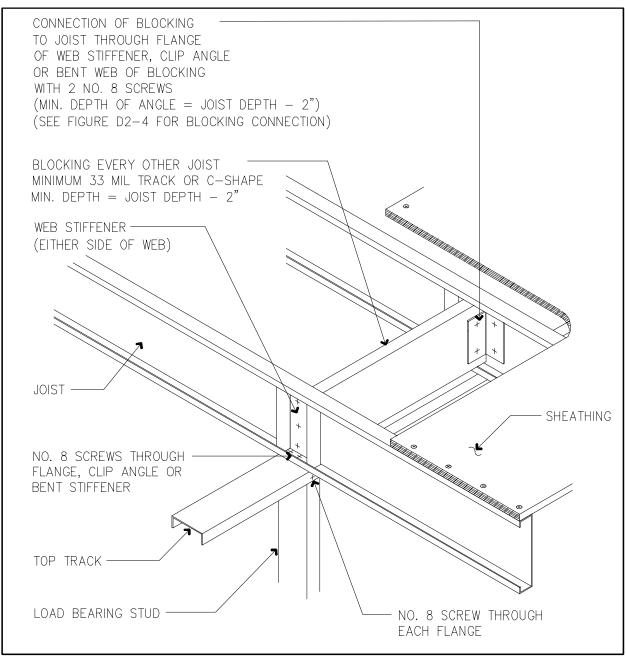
Continuous Span Joist Supported on an Interior Structural Wall
